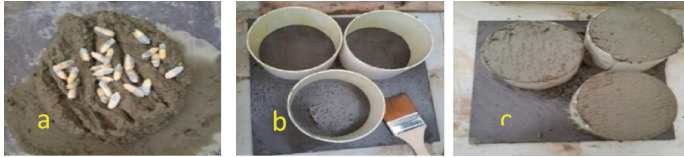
Casting of specimens (a) Capsules sprinkled on mix (b) Oiling of molds (c) Filled molds with mix
